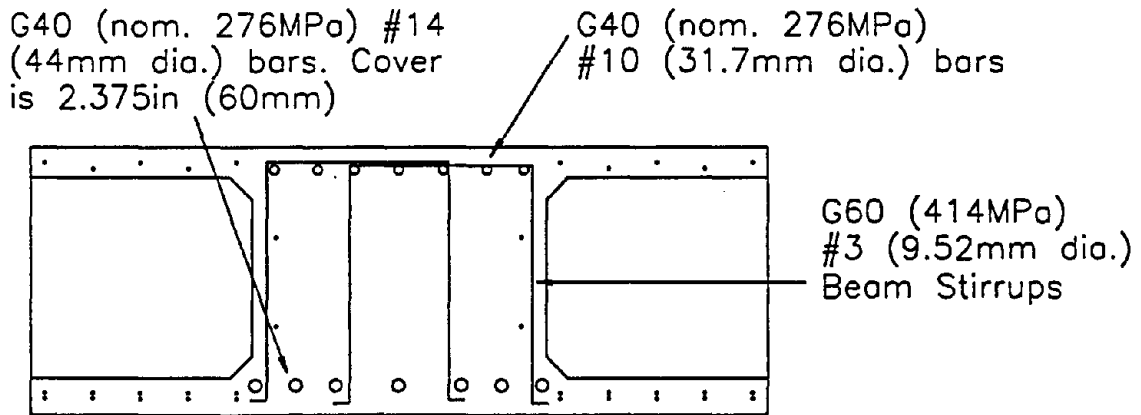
End elevation and reinforcement details of as-built unit SM3
